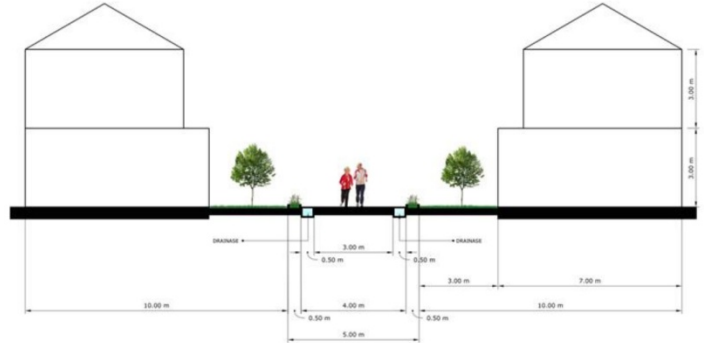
Proposed road geometry of Bhaskara Housing (source: survey, 2017)
